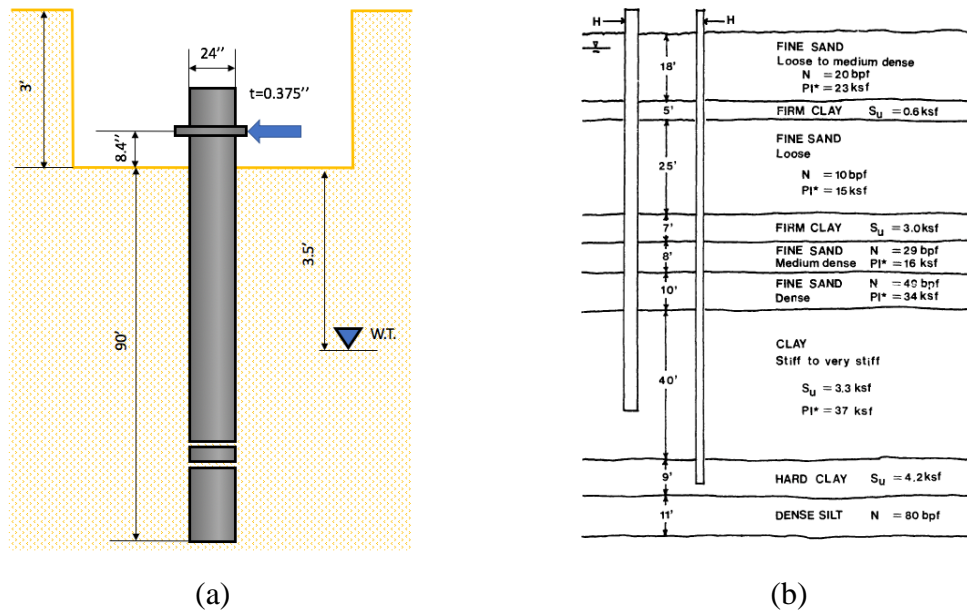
(a) the schematic diagram of the piles and (b) soil profile at test site of the Houston test.
